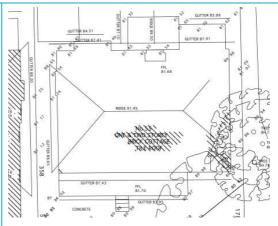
Detail from Survey Plan (Source: North Sydney Council DA Tracker, DA 98/10).
